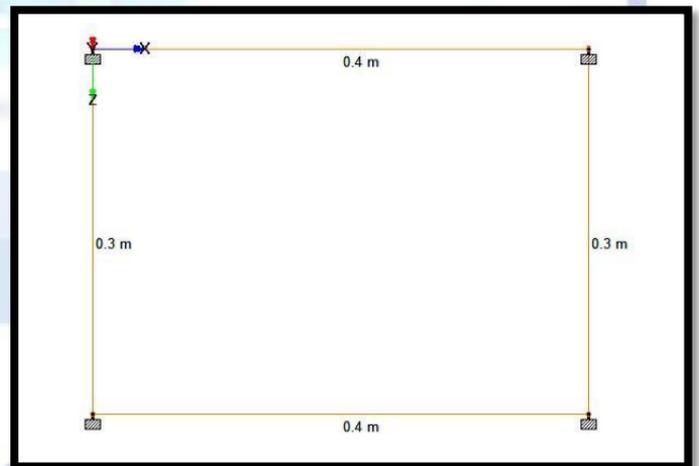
Elevation of sloped frame for 15° inclination]
